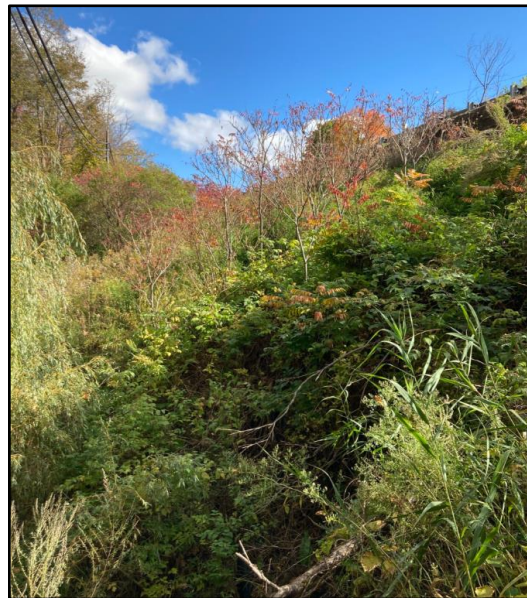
South culvert inlet, looking north (Fall 2024)
